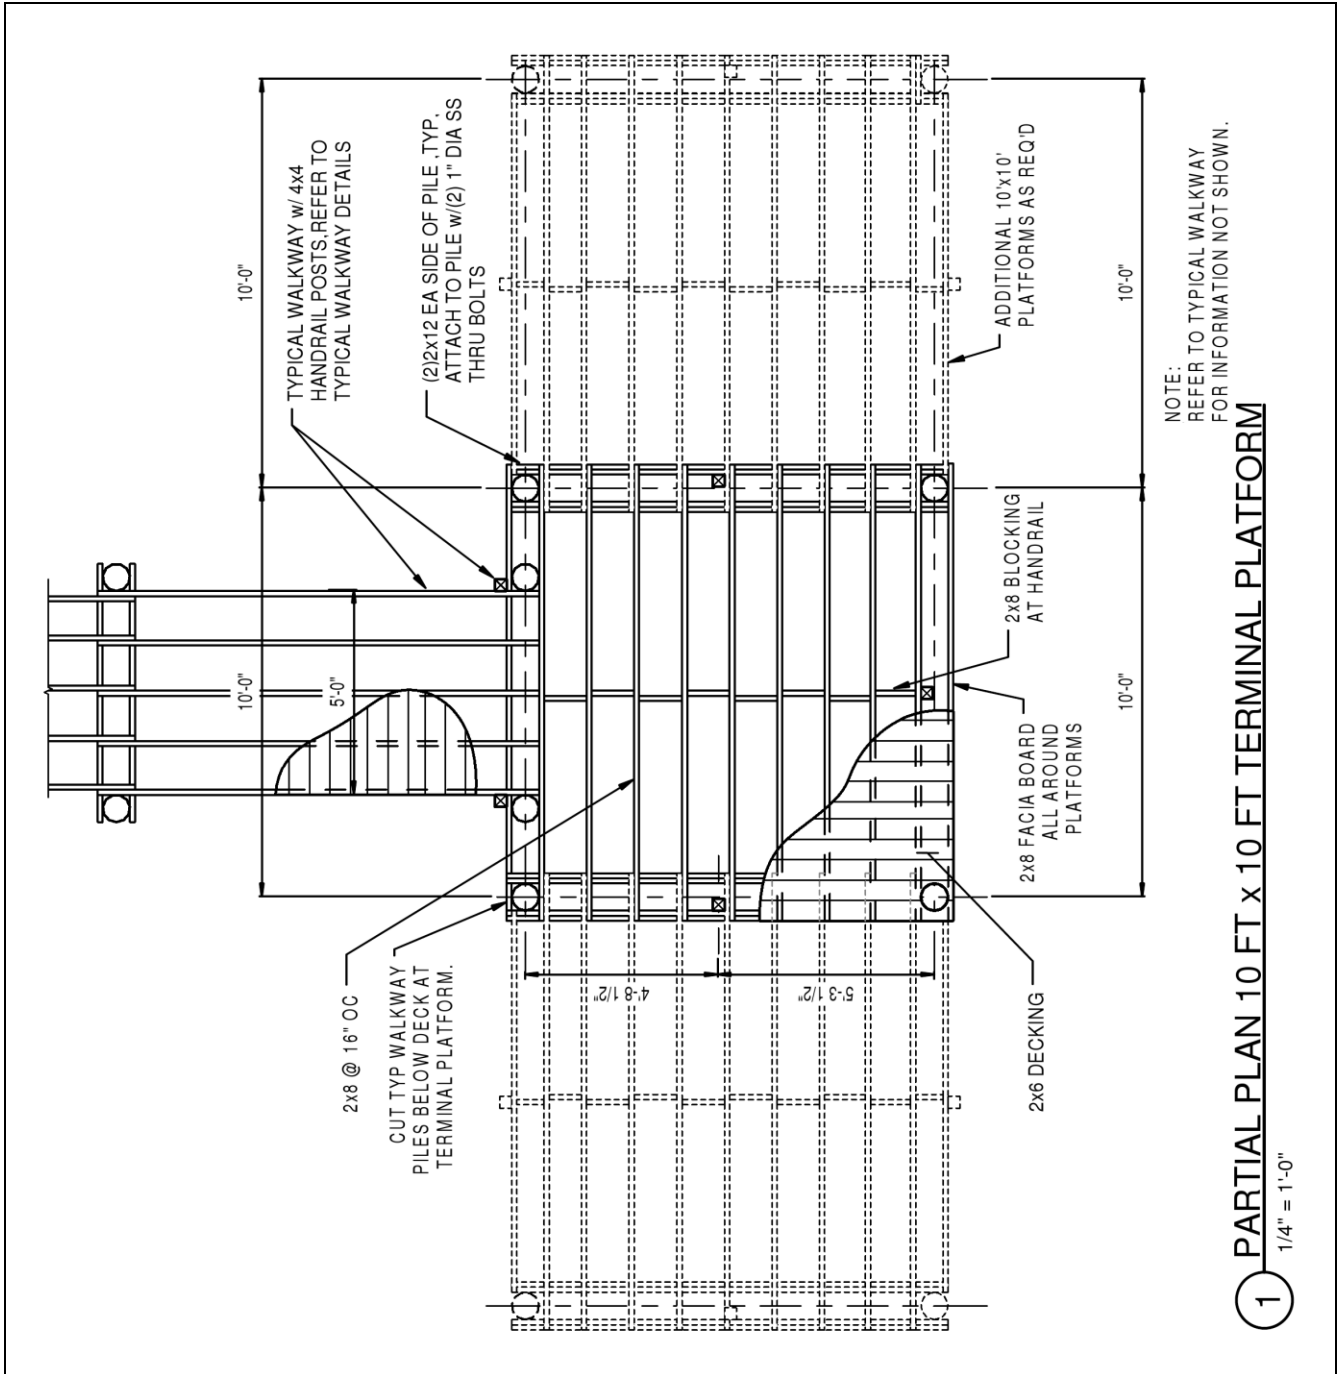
Timber Dock/Terminal Platform, 10'x10'
